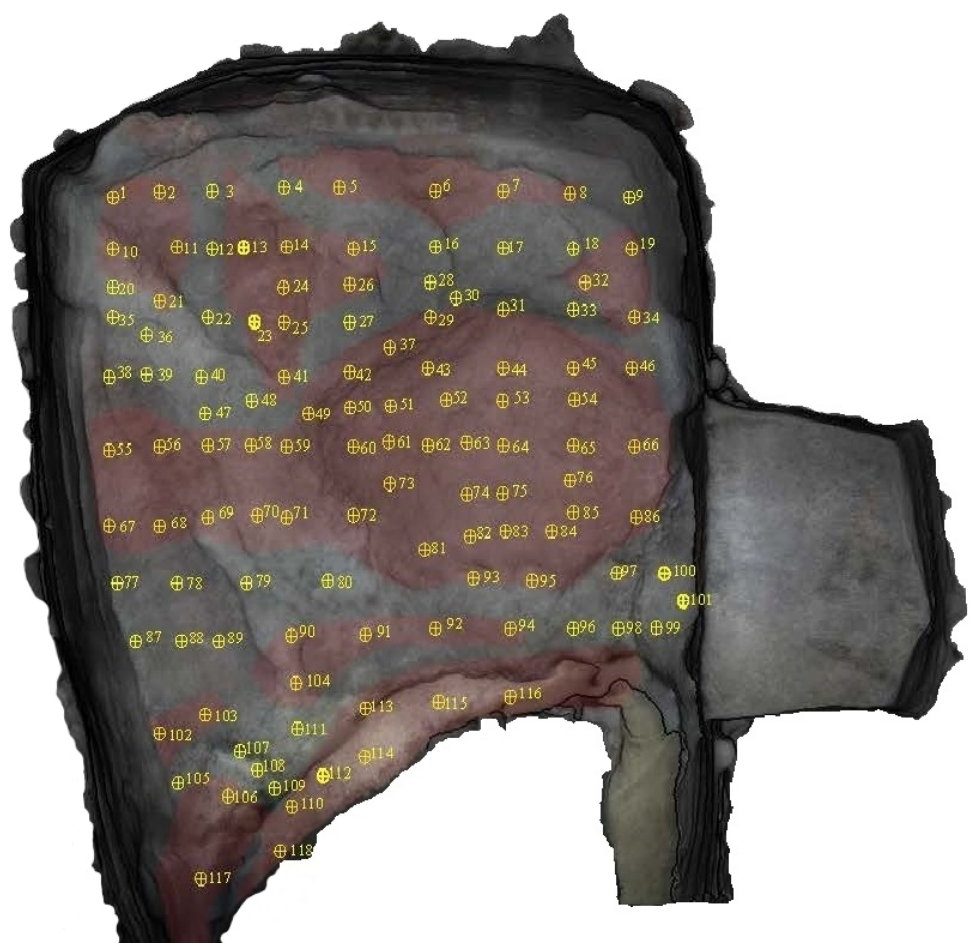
Location of the planned measuring points. In red the zones where GPR has detected inner cracks.
